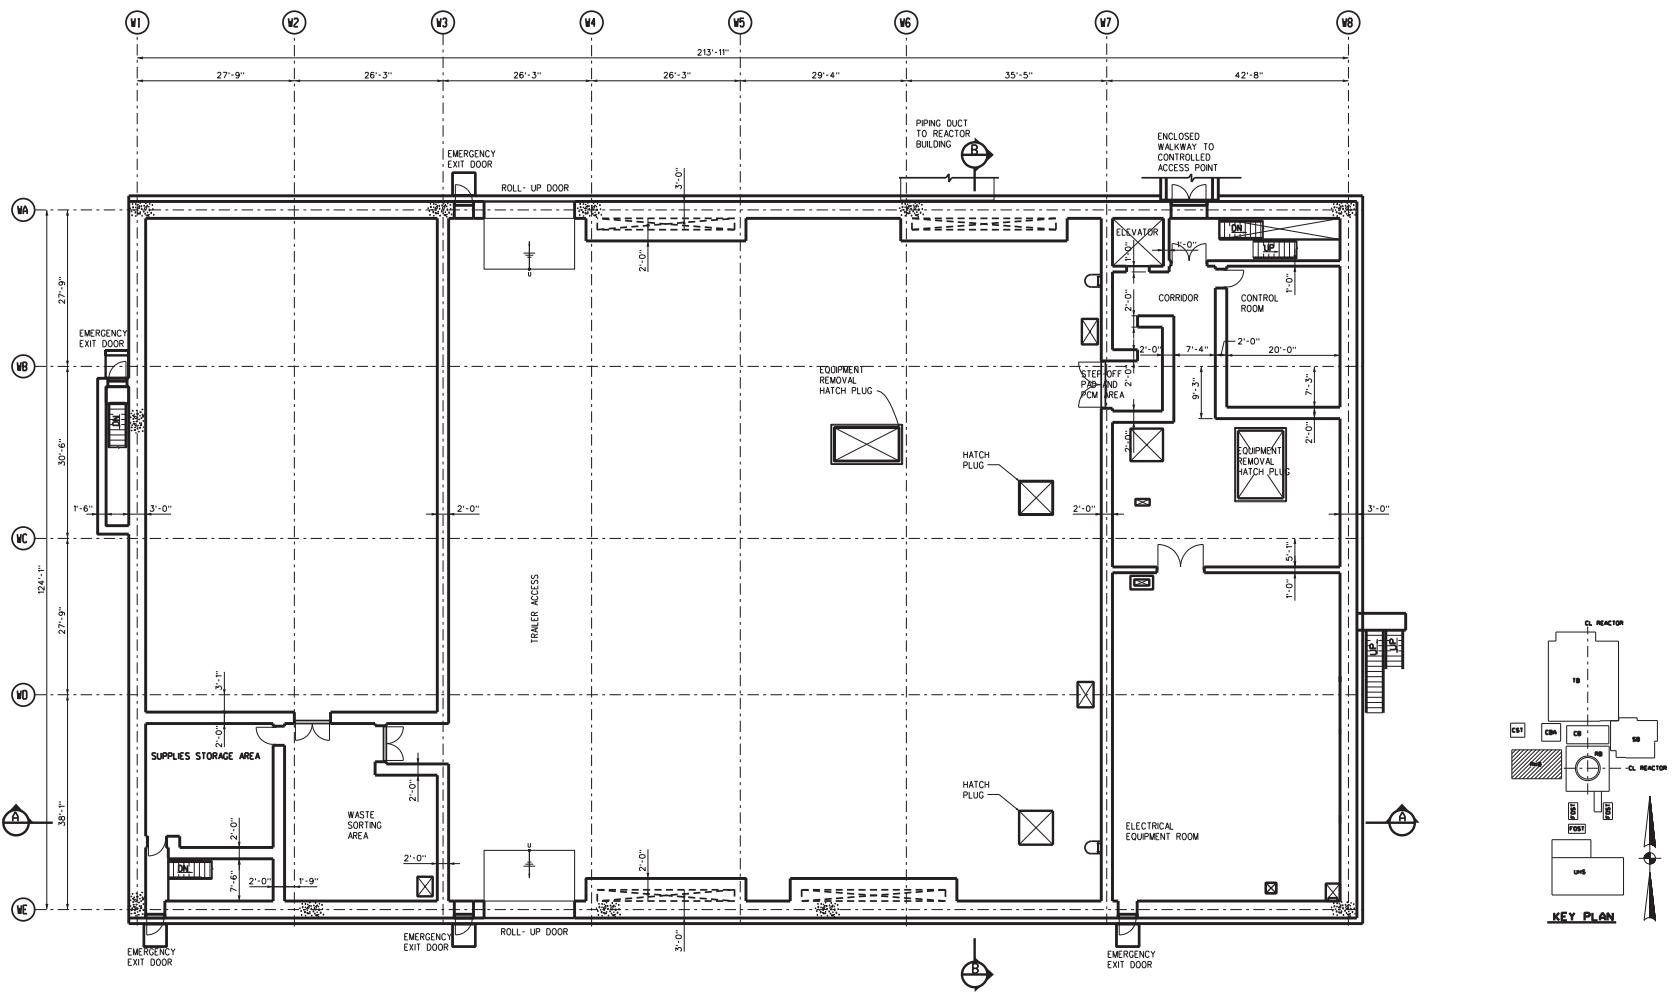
H.3-56 Radwaste Building Floor Plan at Elevation 35'-0"
